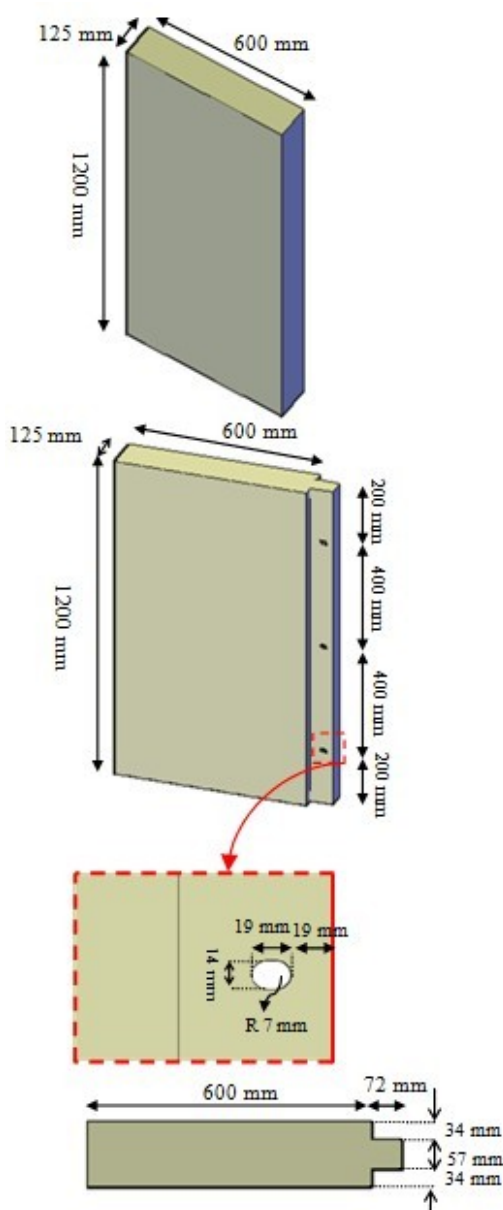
Details and dimensions of concrete wall panels in proposed connection
